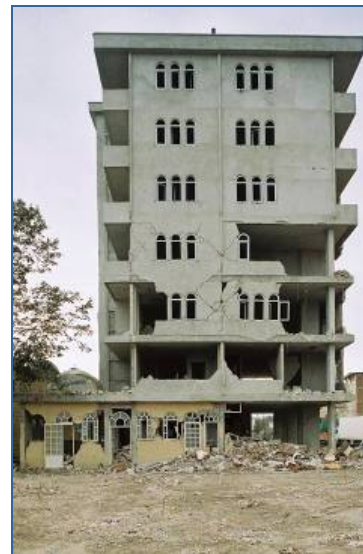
RIGHT: Apartment building in Golcuk after 1999 earthquake shows extensive collapse of infill walls and damage to the RC frame.
